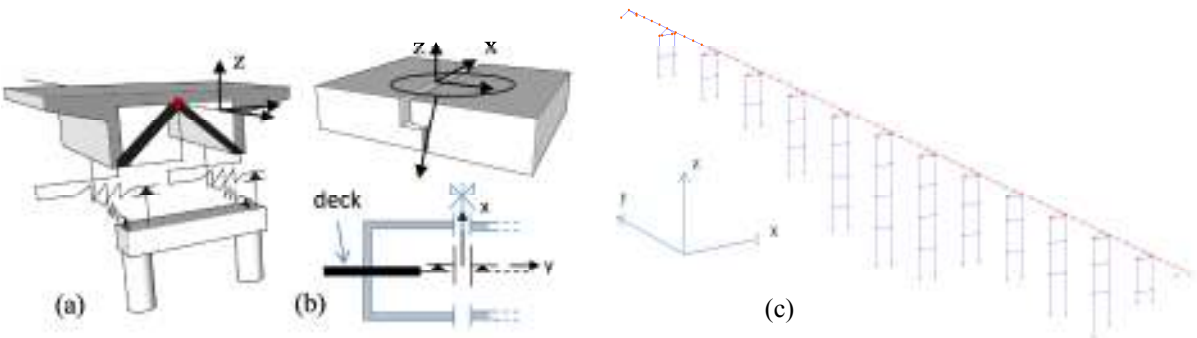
(a) Pier-deck connection model (b) Gerber Saddle model (c) The OpenSees model of the viaduct
